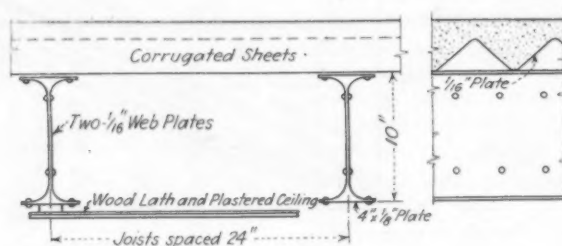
What is known as the Renwick joist was used in the Bank of the State of New York building erected in 1855 at William Street and Exchange Place, New York, and razed in 1903.
